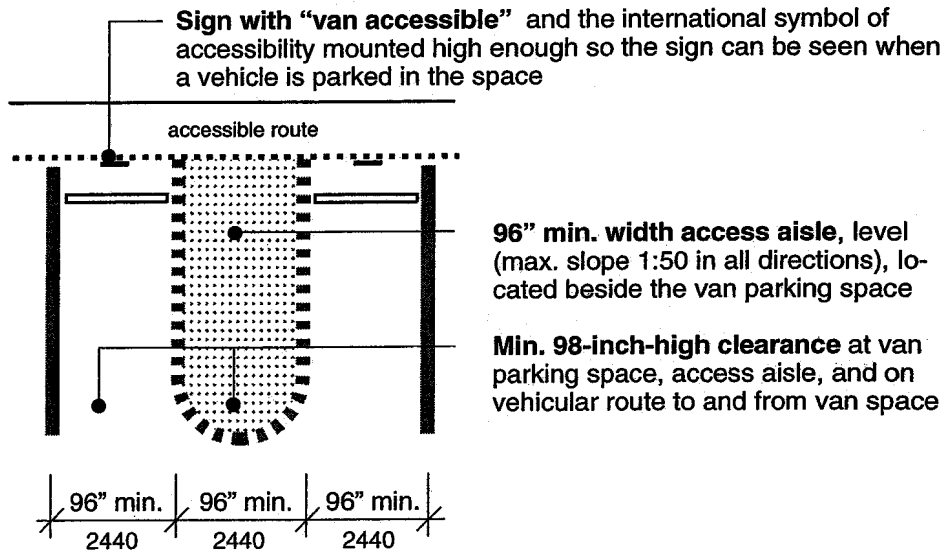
ADA PARKING STALL REQUIREMENTS
